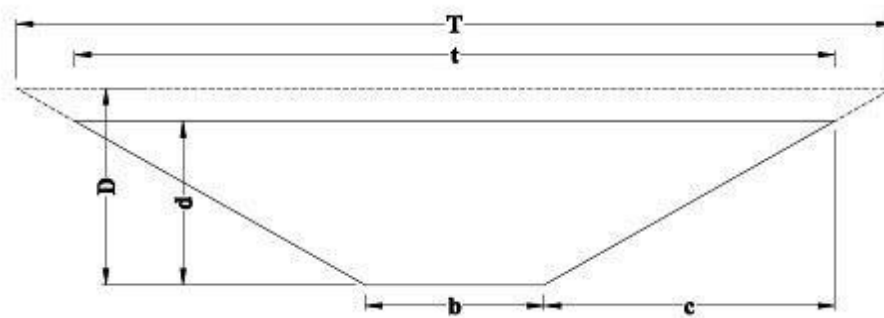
Trapezoidal Cross-section. (Source: Murty, 2009)
